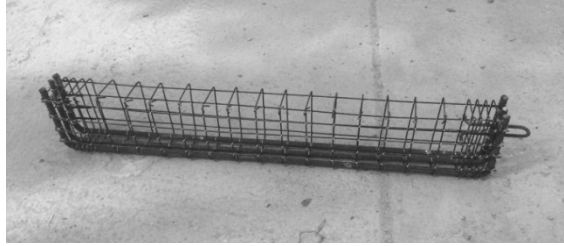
Steel Reinforcement Cage Used for Deep Beams.
